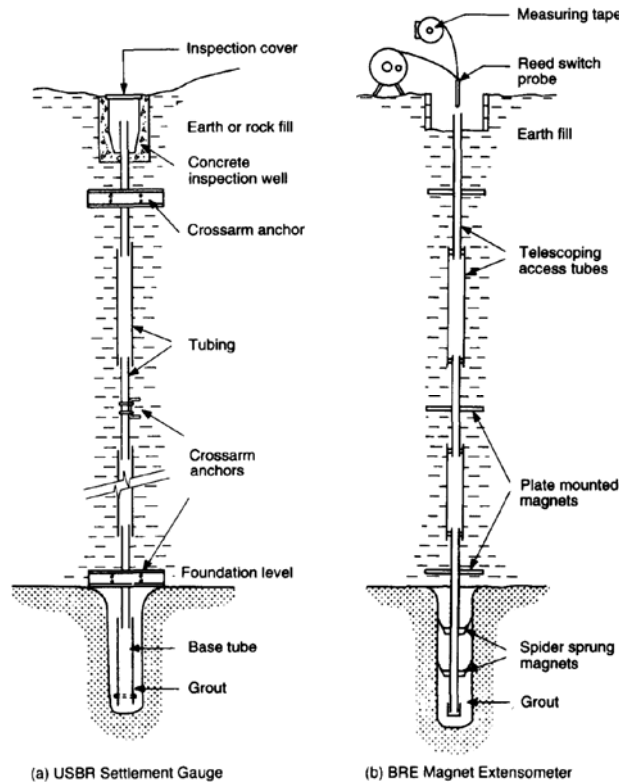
USBR settlement gauge and BRE magnet extensometer.
